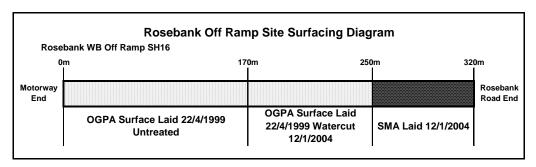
Rosebank Road off ramp westbound surfacing diagram.
